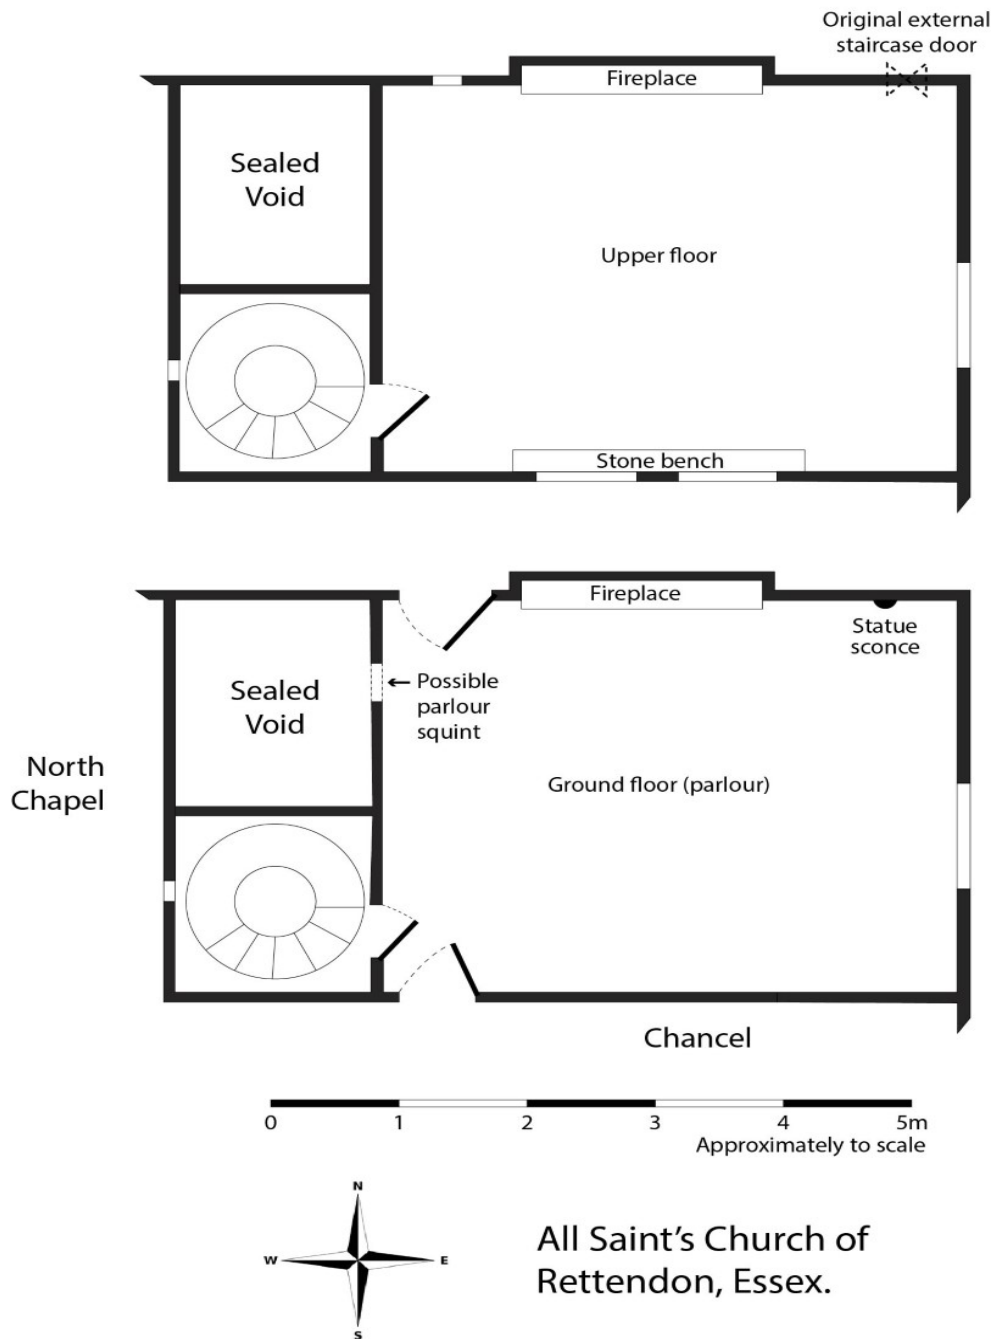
Drawing of the 'anchorite house' – upper and lower levels, and parlour. All Saint's Church of Rettendon, Essex.
